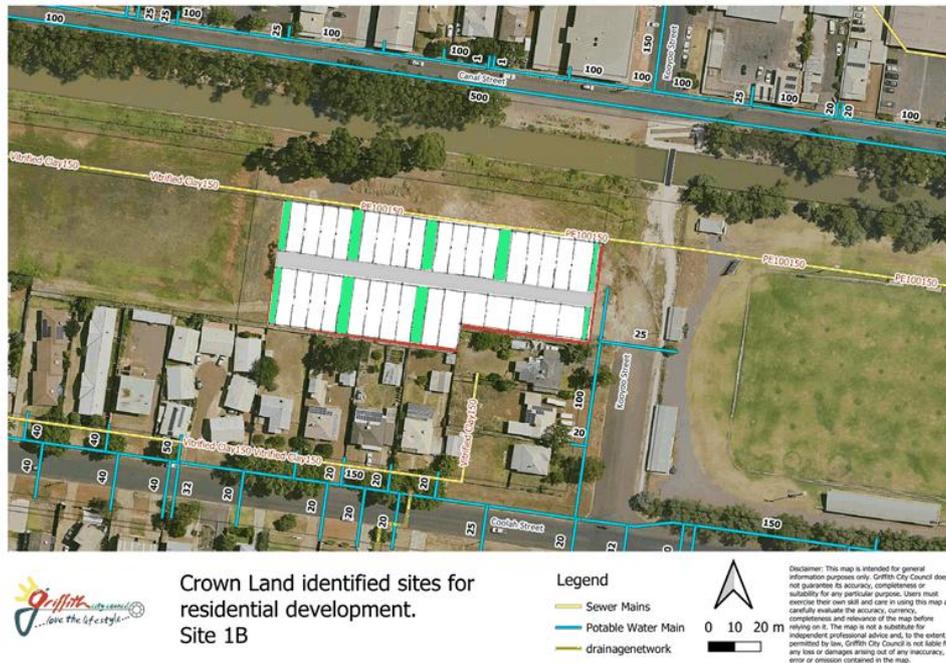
Site 1B - Kooyoo Street - Indicative Capacity of 32 Townhouses. Source: PSA Consulting.
